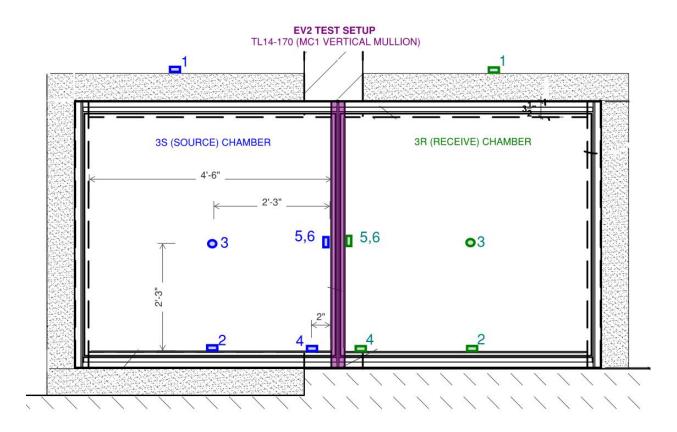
EV2 [B_v] Curtain Wall Elevation with 3R Chamber Accelerometer Locations 02, 05, 03
